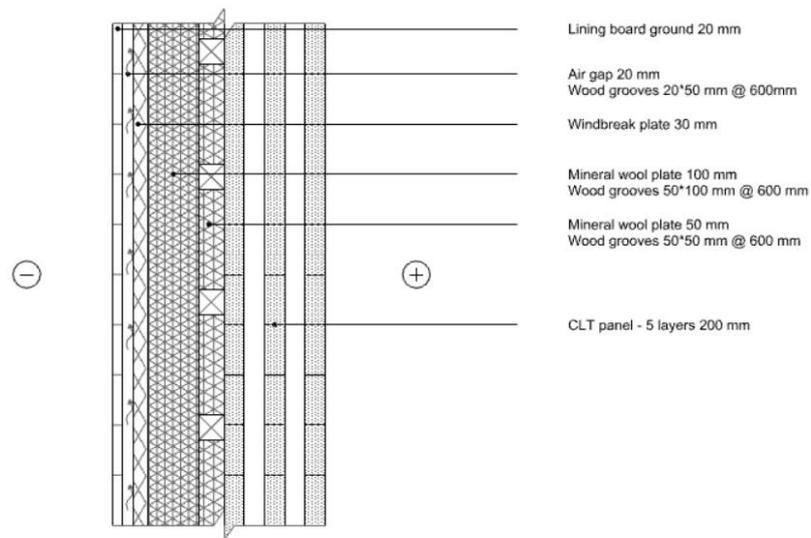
Details of layers of Cross-Laminated Timber Walls (V2)
